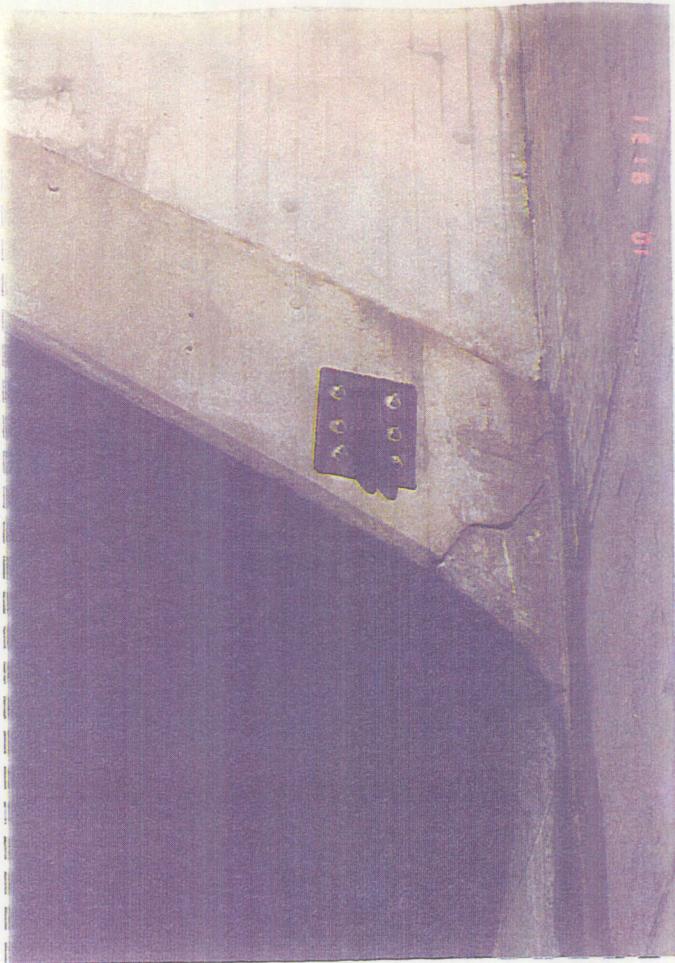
Morris Dam - 70' x 18' Drum Gates - Gate #1, View from downstream faceplate looking up towards spillway bridge at bracket used for ram. Note concrete cracking at intersection of bridge of pier wall.
